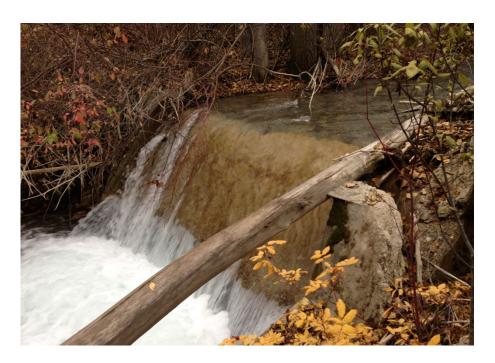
Concrete diversion weir upstream of Windermere Loop Road culvert, Sta. 4+190.
